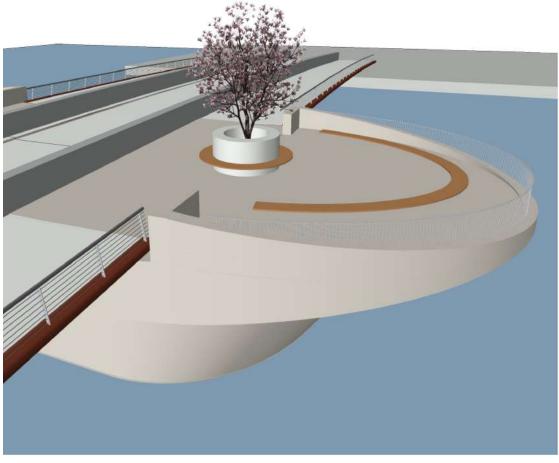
Bascule Pier public realm with seating, planting, and views
